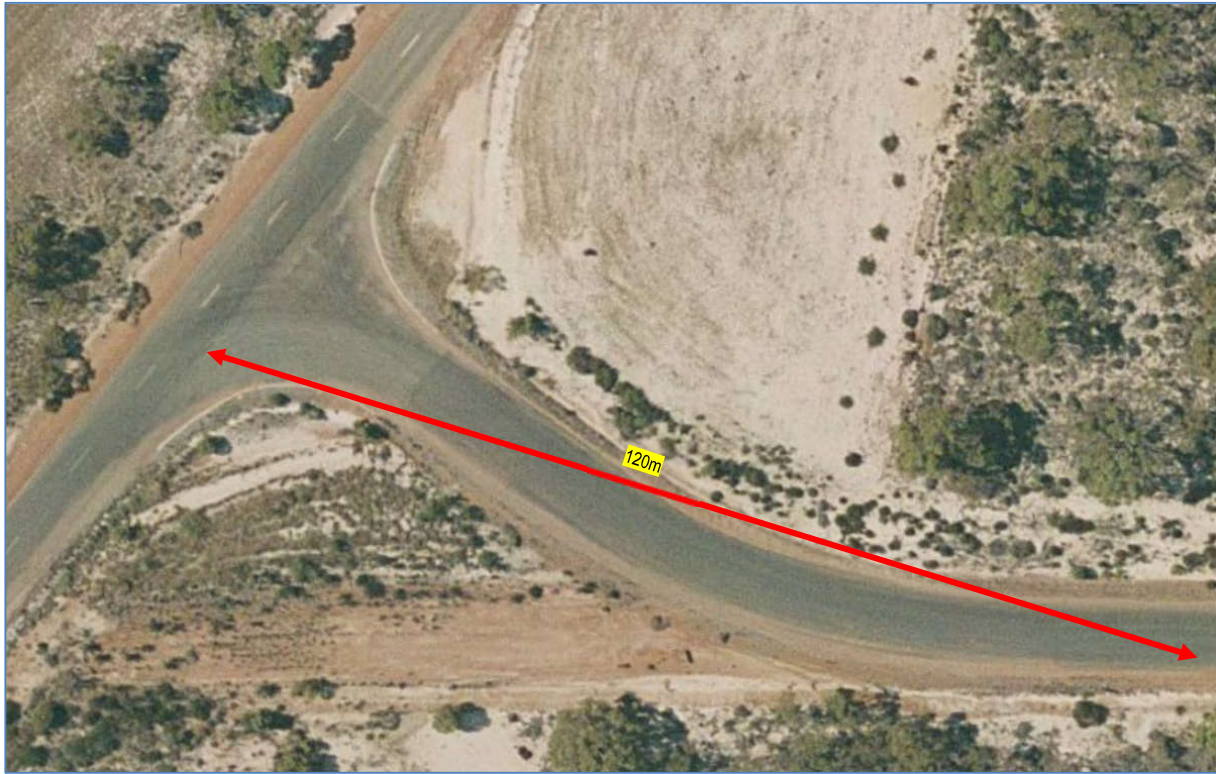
Available ASD At Nyabing-Pingrup Road and Jolley Road Intersection
